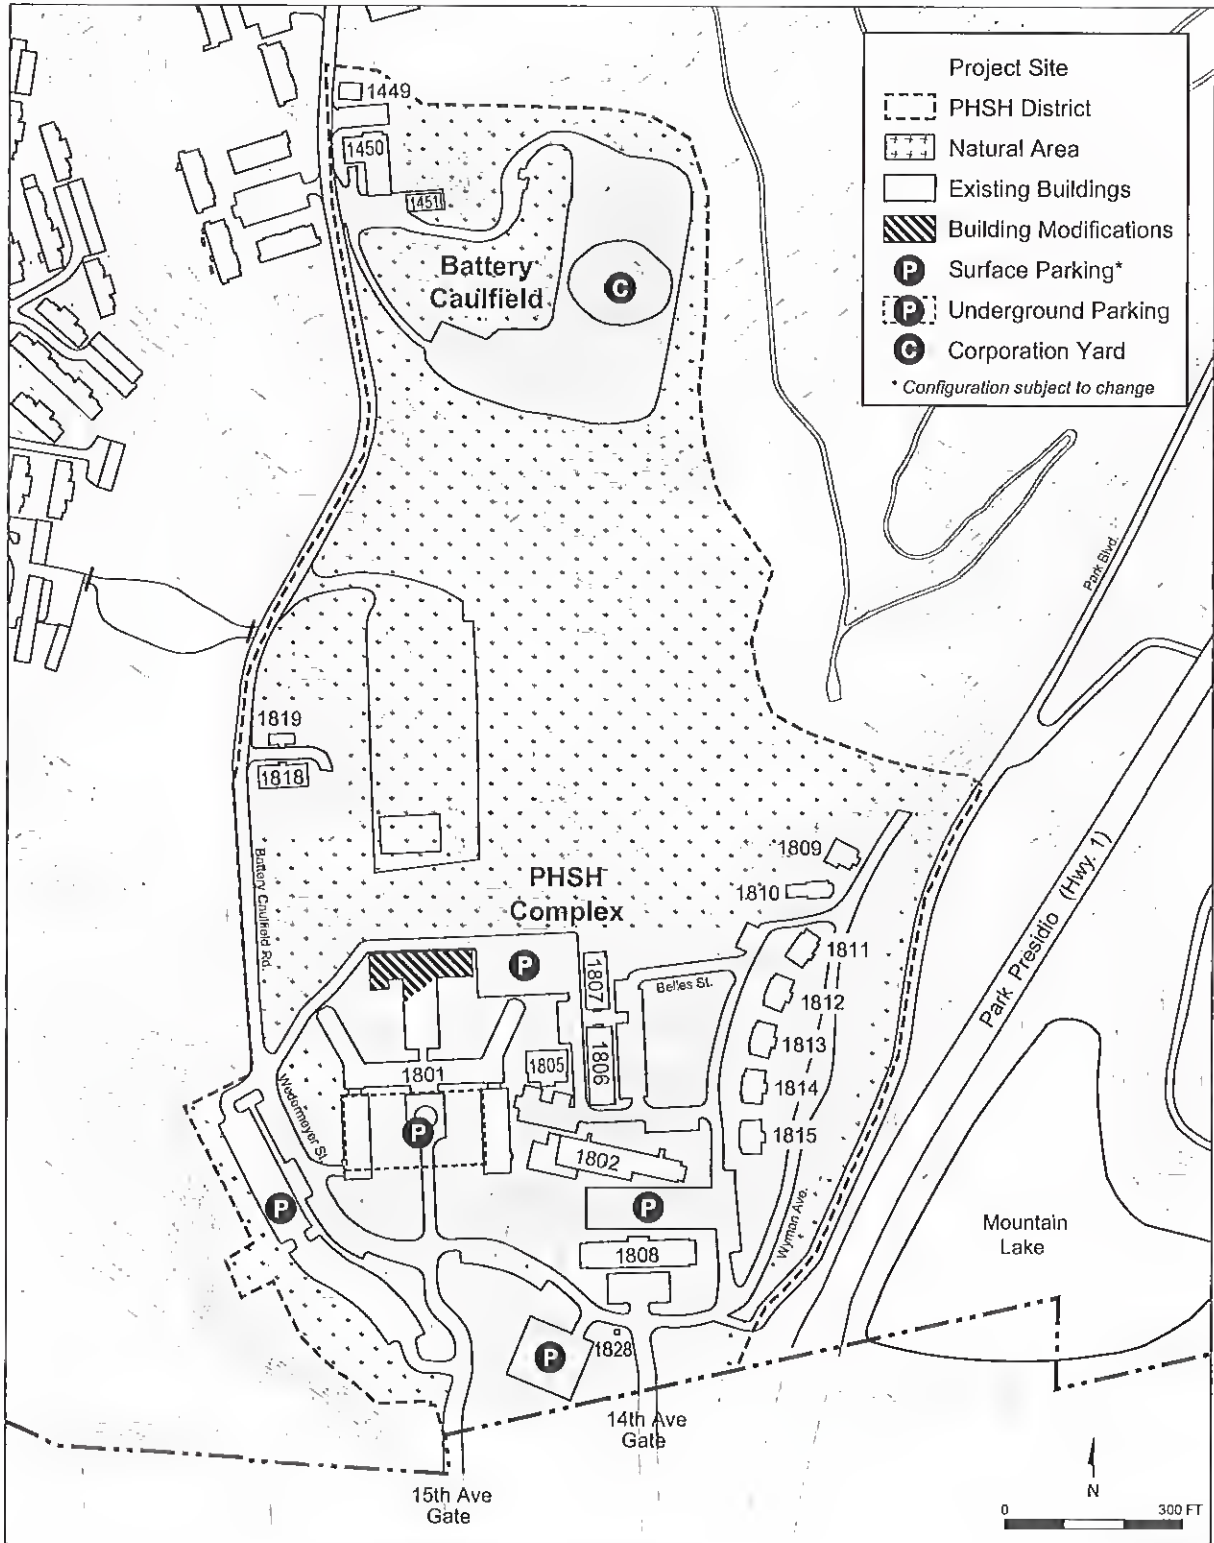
ALTERNATIVE 2: WINGS RETAINED / TRUST REVISED ALTERNATIVE
